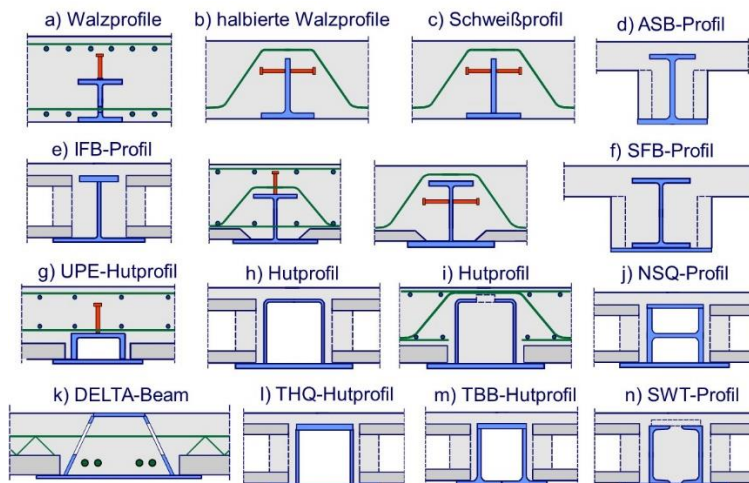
Types of slim-floor beams [Sch2007]
